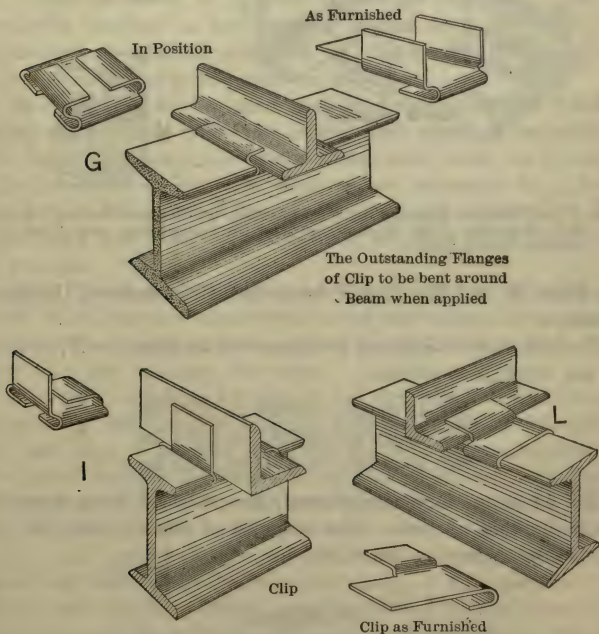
Clips for Fastening Tees and Angles to Beams and Channels.
